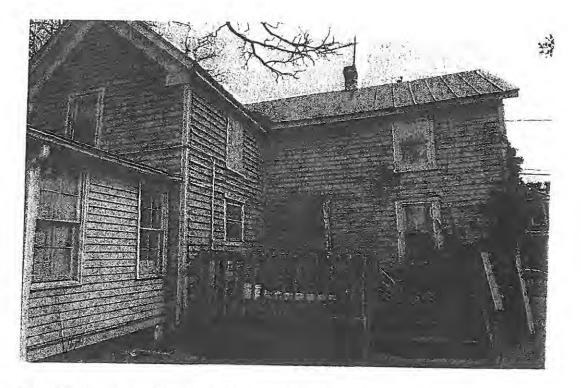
Deteriorated Rear Deck and Improper Foundation Support for Addition
